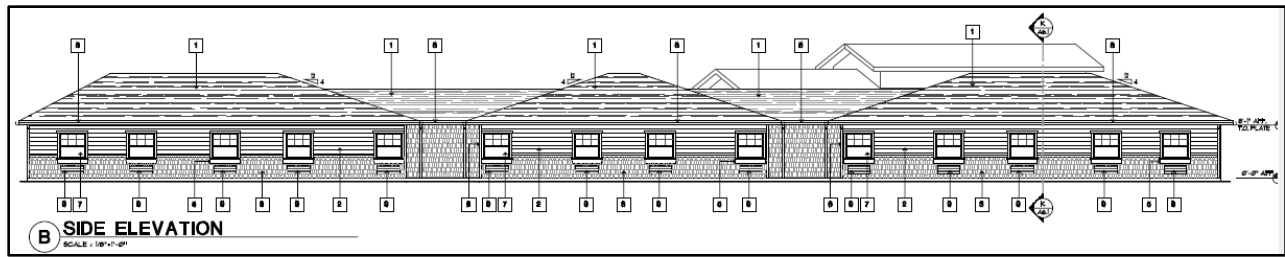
Applicant's Proposed Site Plan, Elevations & Rendering
